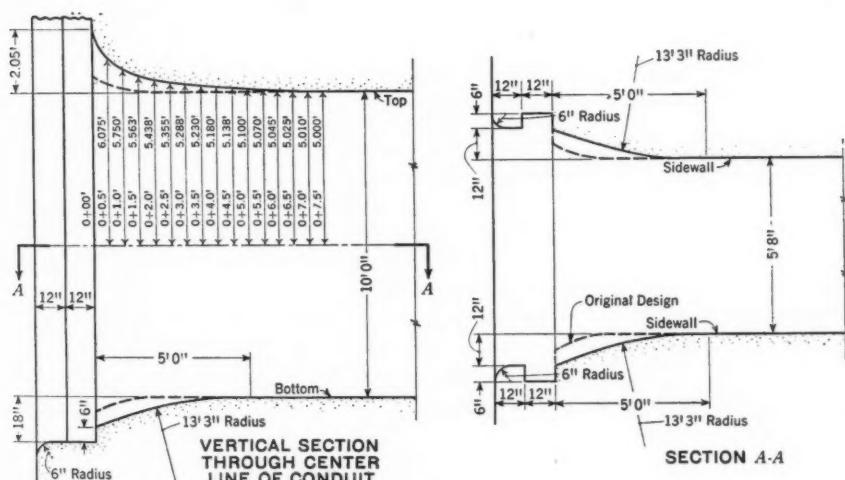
DESIGN NO. 2, MADDEN DAM CONDUIT ENTRANCE, ADOPTED FOR CONDUITS 1 TO 4
